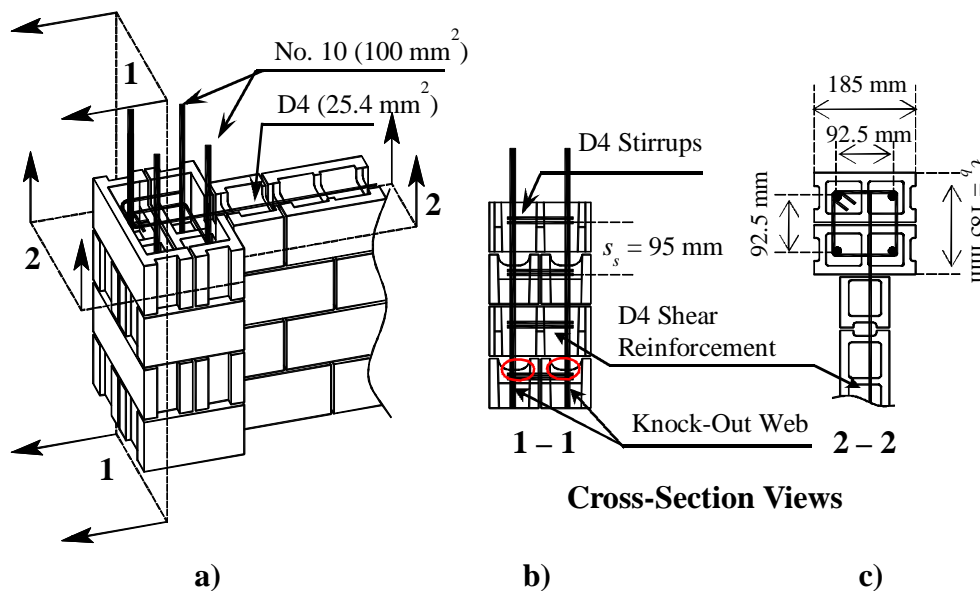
Boundary Element Detailing: a) Boundary Element Tied into Web of a RM Wall, b) Elevation View (Section 1-1) and c) Plan View (Section 2-2)
